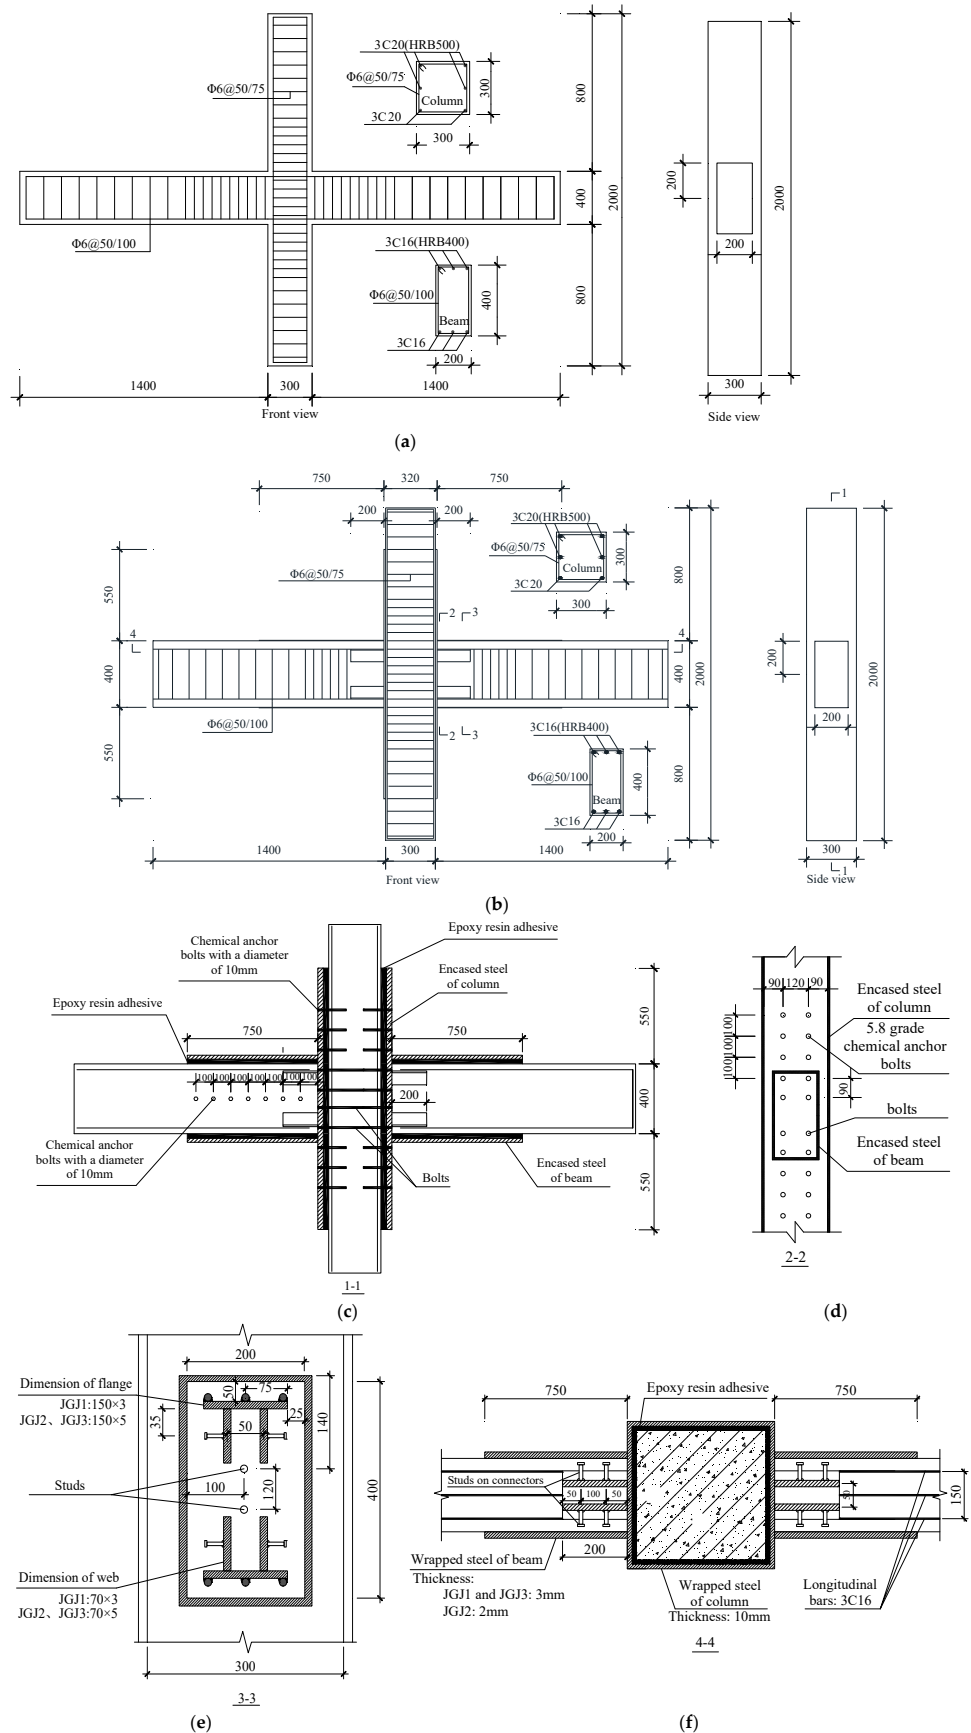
Design scheme: (a) BZJ; (b) new type of specimen; (c) 1-1 sectional view of the new type of specimen; (d) 2-2 sectional view of the new type of specimen; (e) 3-3 sectional view of the new type of specimen; (f) 4-4 sectional view of the new type of specimen.
